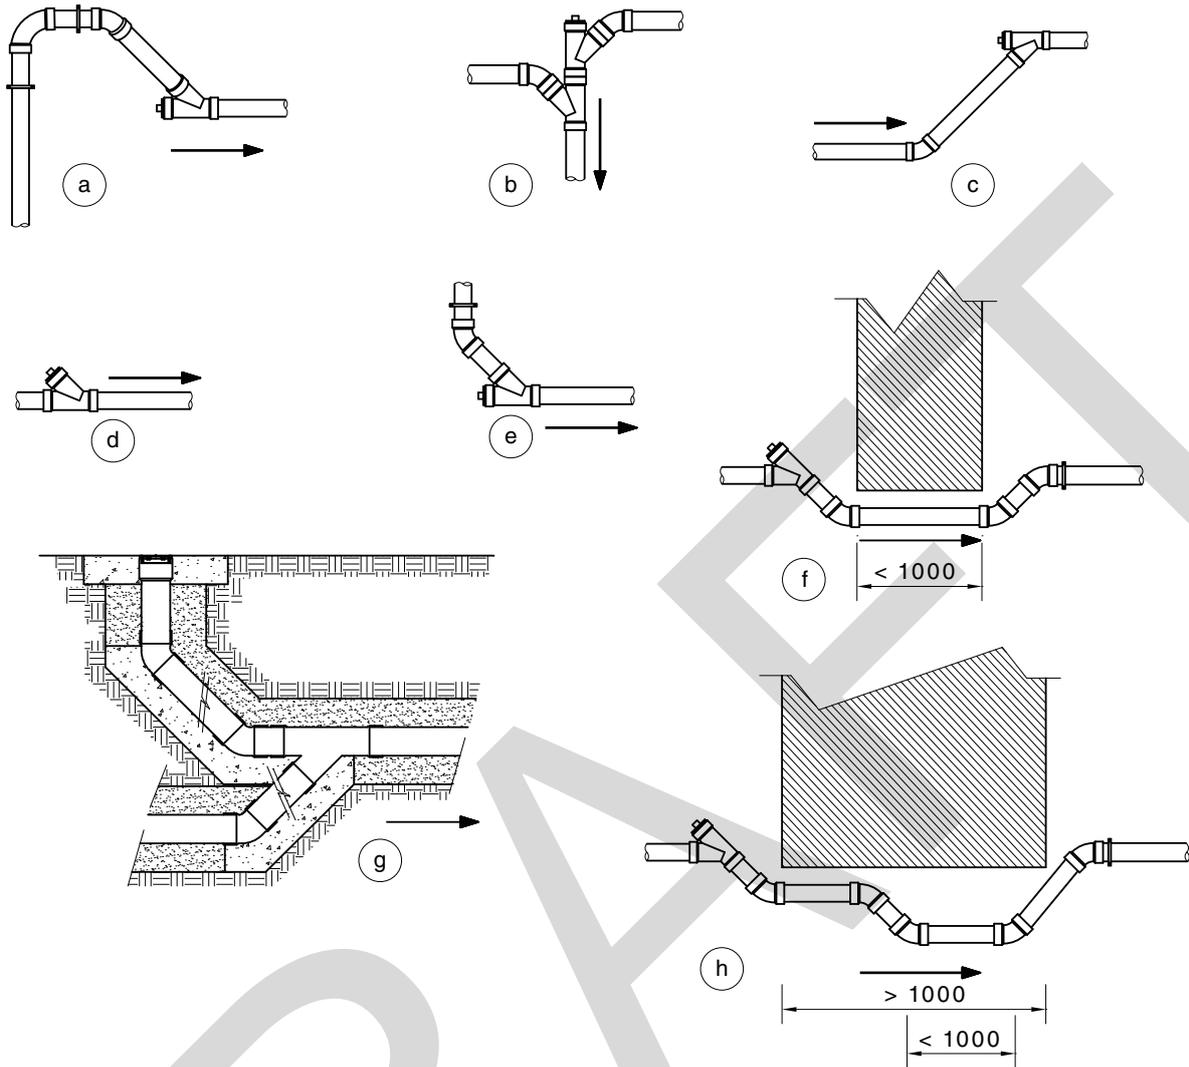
TYPICAL LOCATIONS OF INSPECTION OPENINGS
